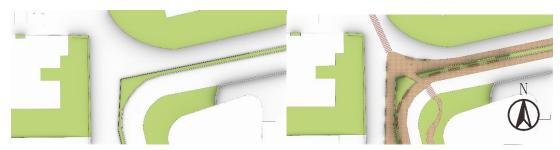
Plan Before and After the Design (Source: Drawn by the author)
